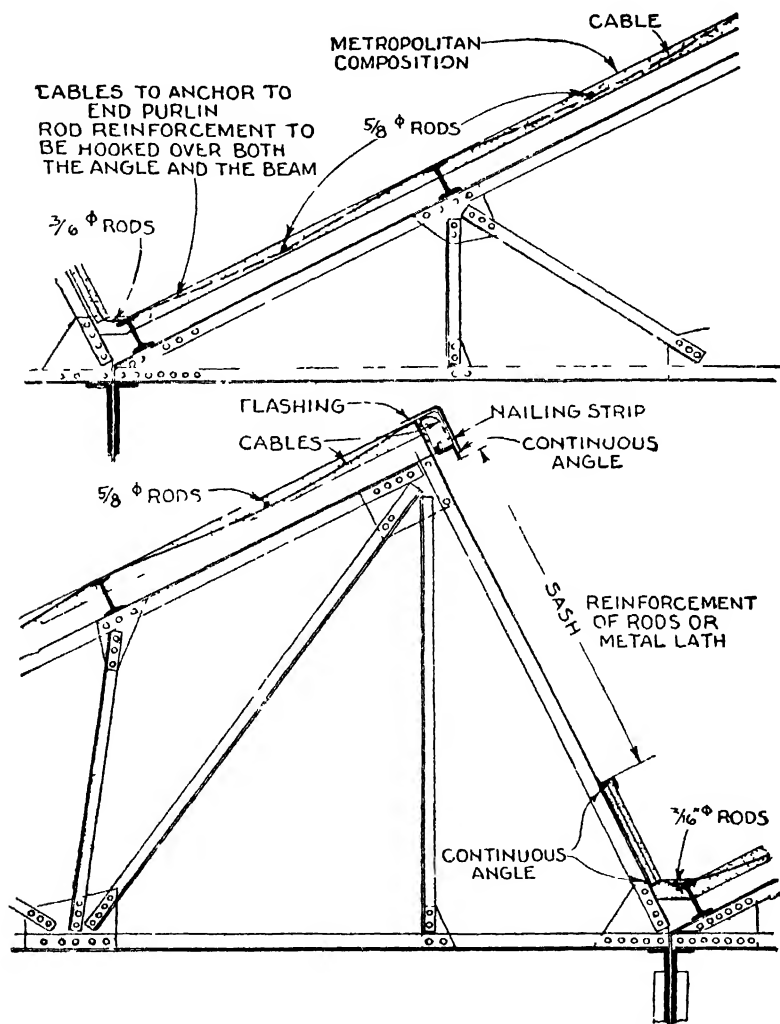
,741 Standard sawtooth truss with purlins, fireproof roof construction, lower end
